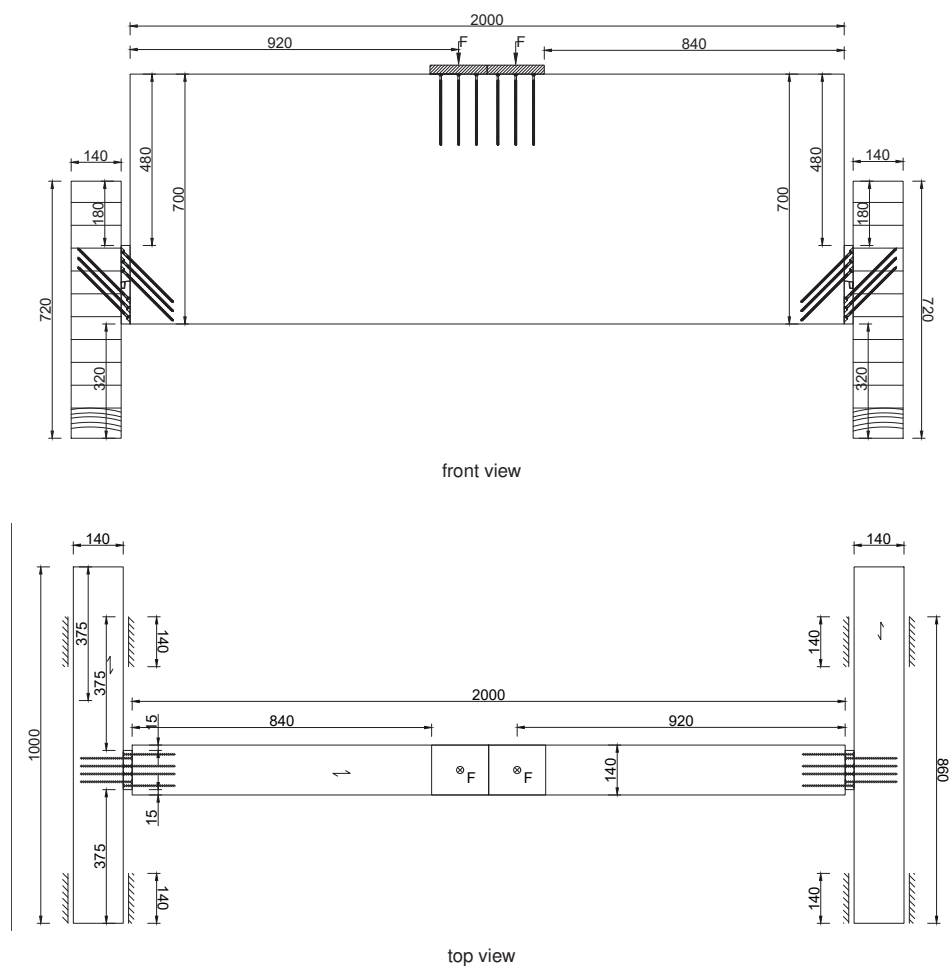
Test specimens for main beam to secondary beam tests with connector v2.
